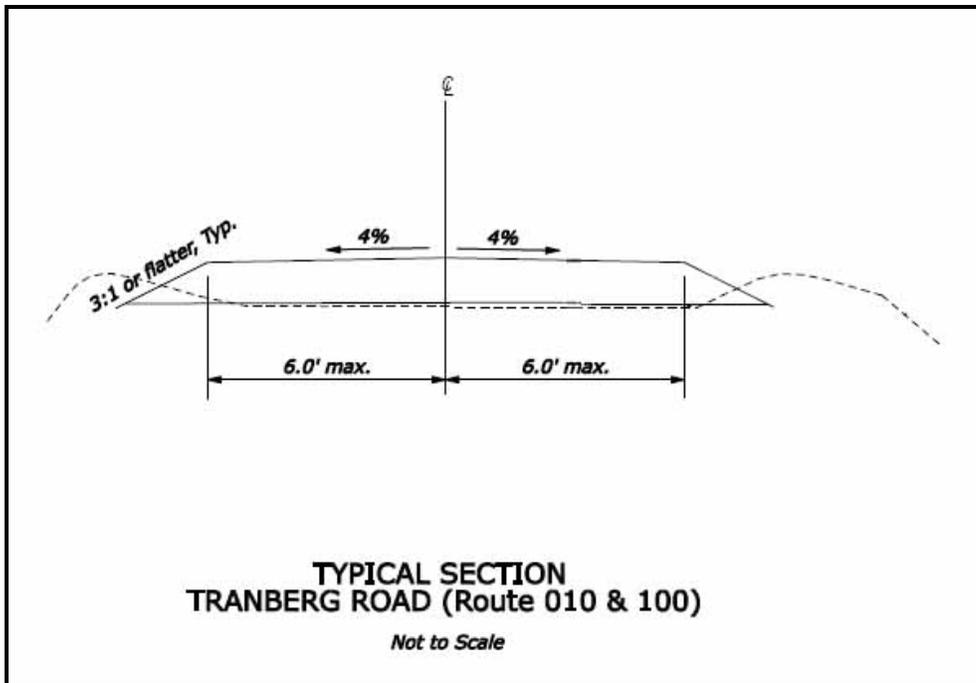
The typical pavement section would be used for the placement of aggregate material along Tranberg Road. The material would be placed within the previously disturbed area of the existing roadway.
